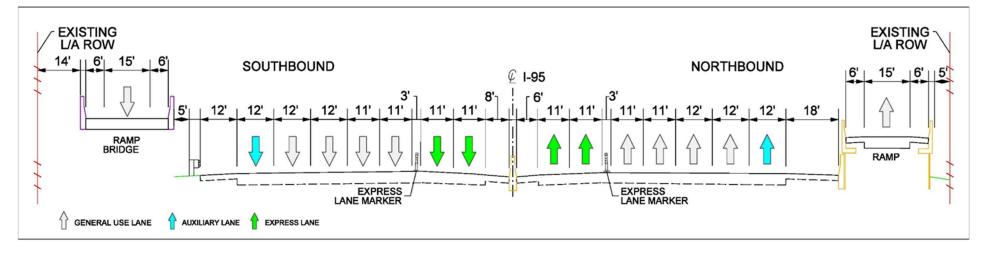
I-95 Alternative 1 Roadway Section North of Hallandale Beach Boulevard
